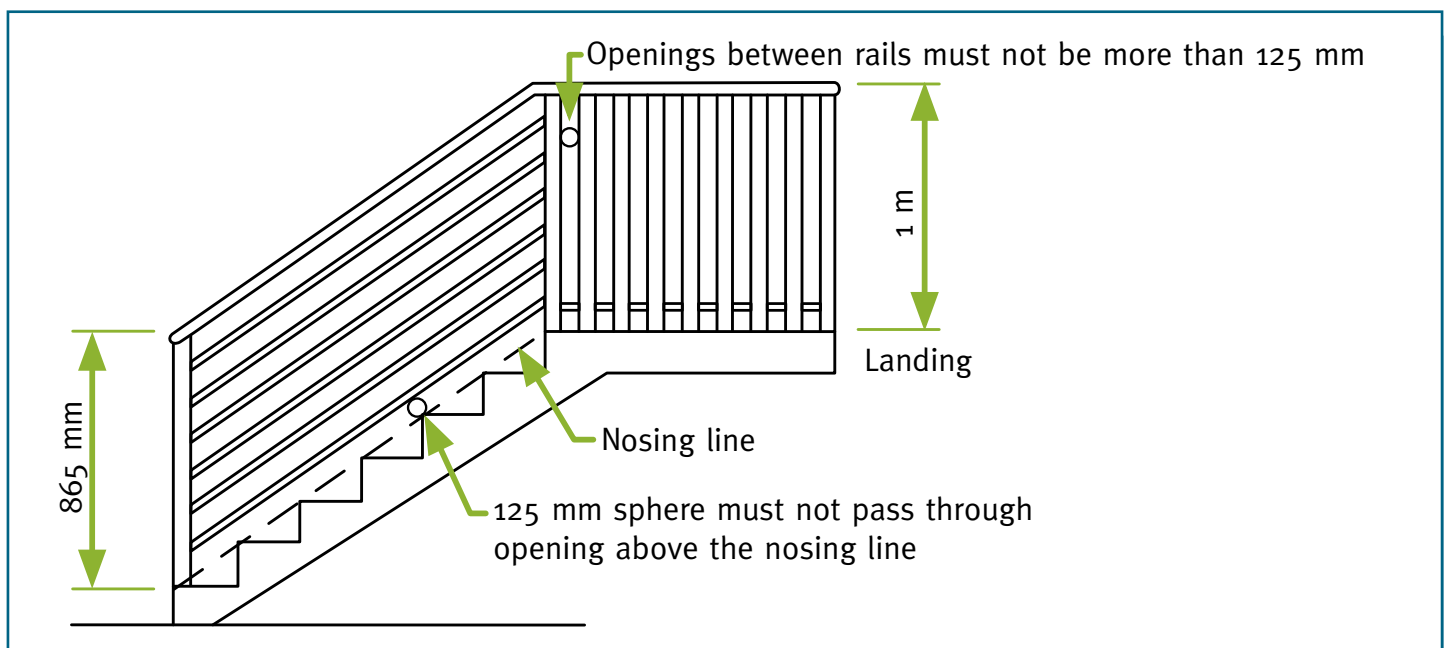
Balustrade or other barrier construction (Courtesy: Australian Building Codes Board)
